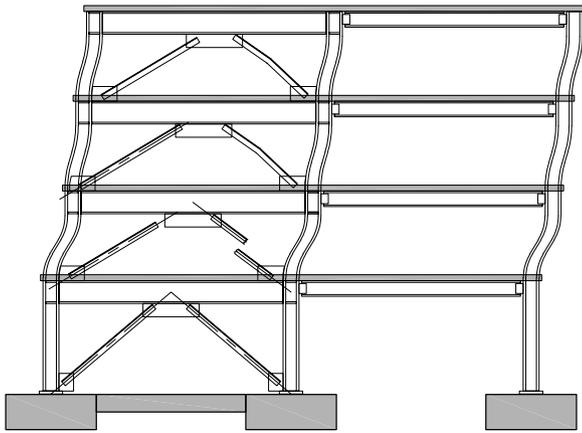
Gravity beams, columns and slab improve distribution of drift.
